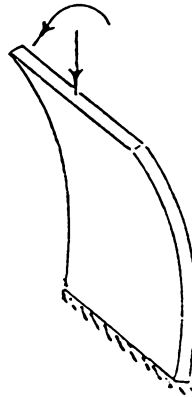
Cantilever Beam Simulation of Gusset Plates
